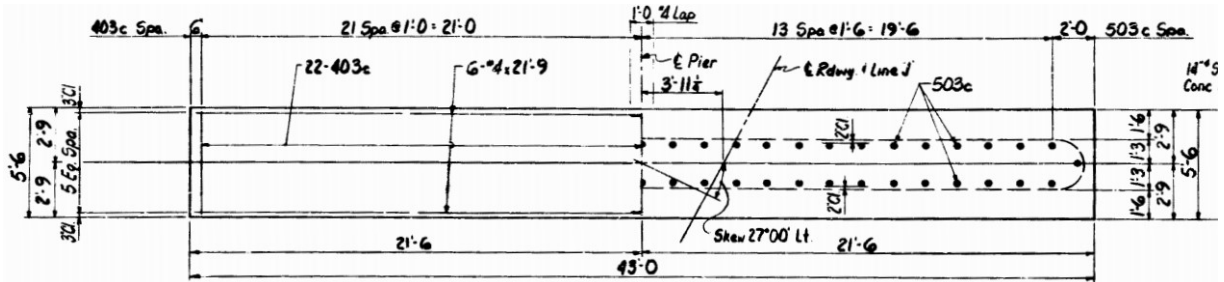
Cross-section of Typical Interior Pier of Bridge (NBI 19430) (1982)
